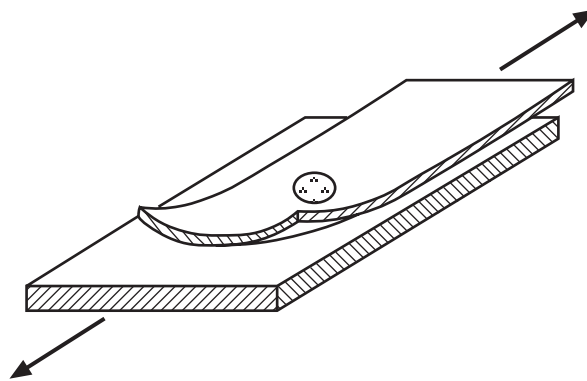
Out of Plane Distortion of Welded Connection
